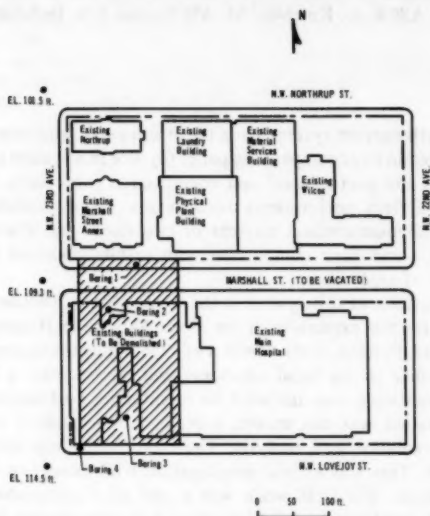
Foundation Excavation Good Samaritan Hospital, Portland, Oregon (1 ft = 0.305 m)
